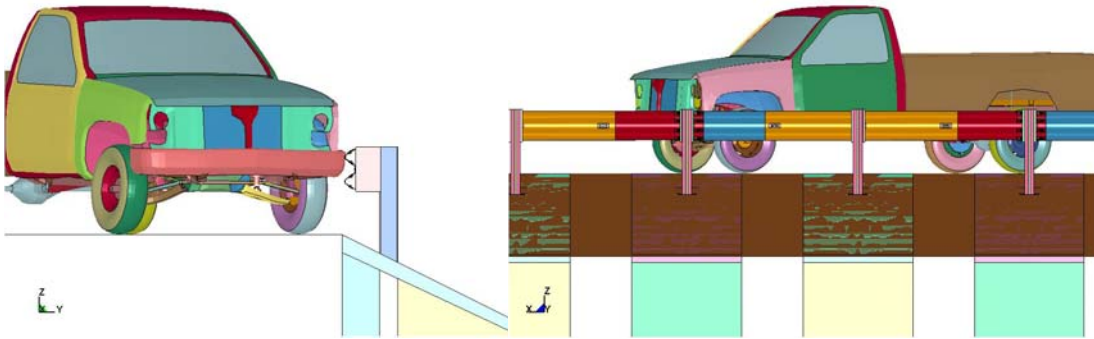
Guardrail on slope system with 6'-3" post spacing.
